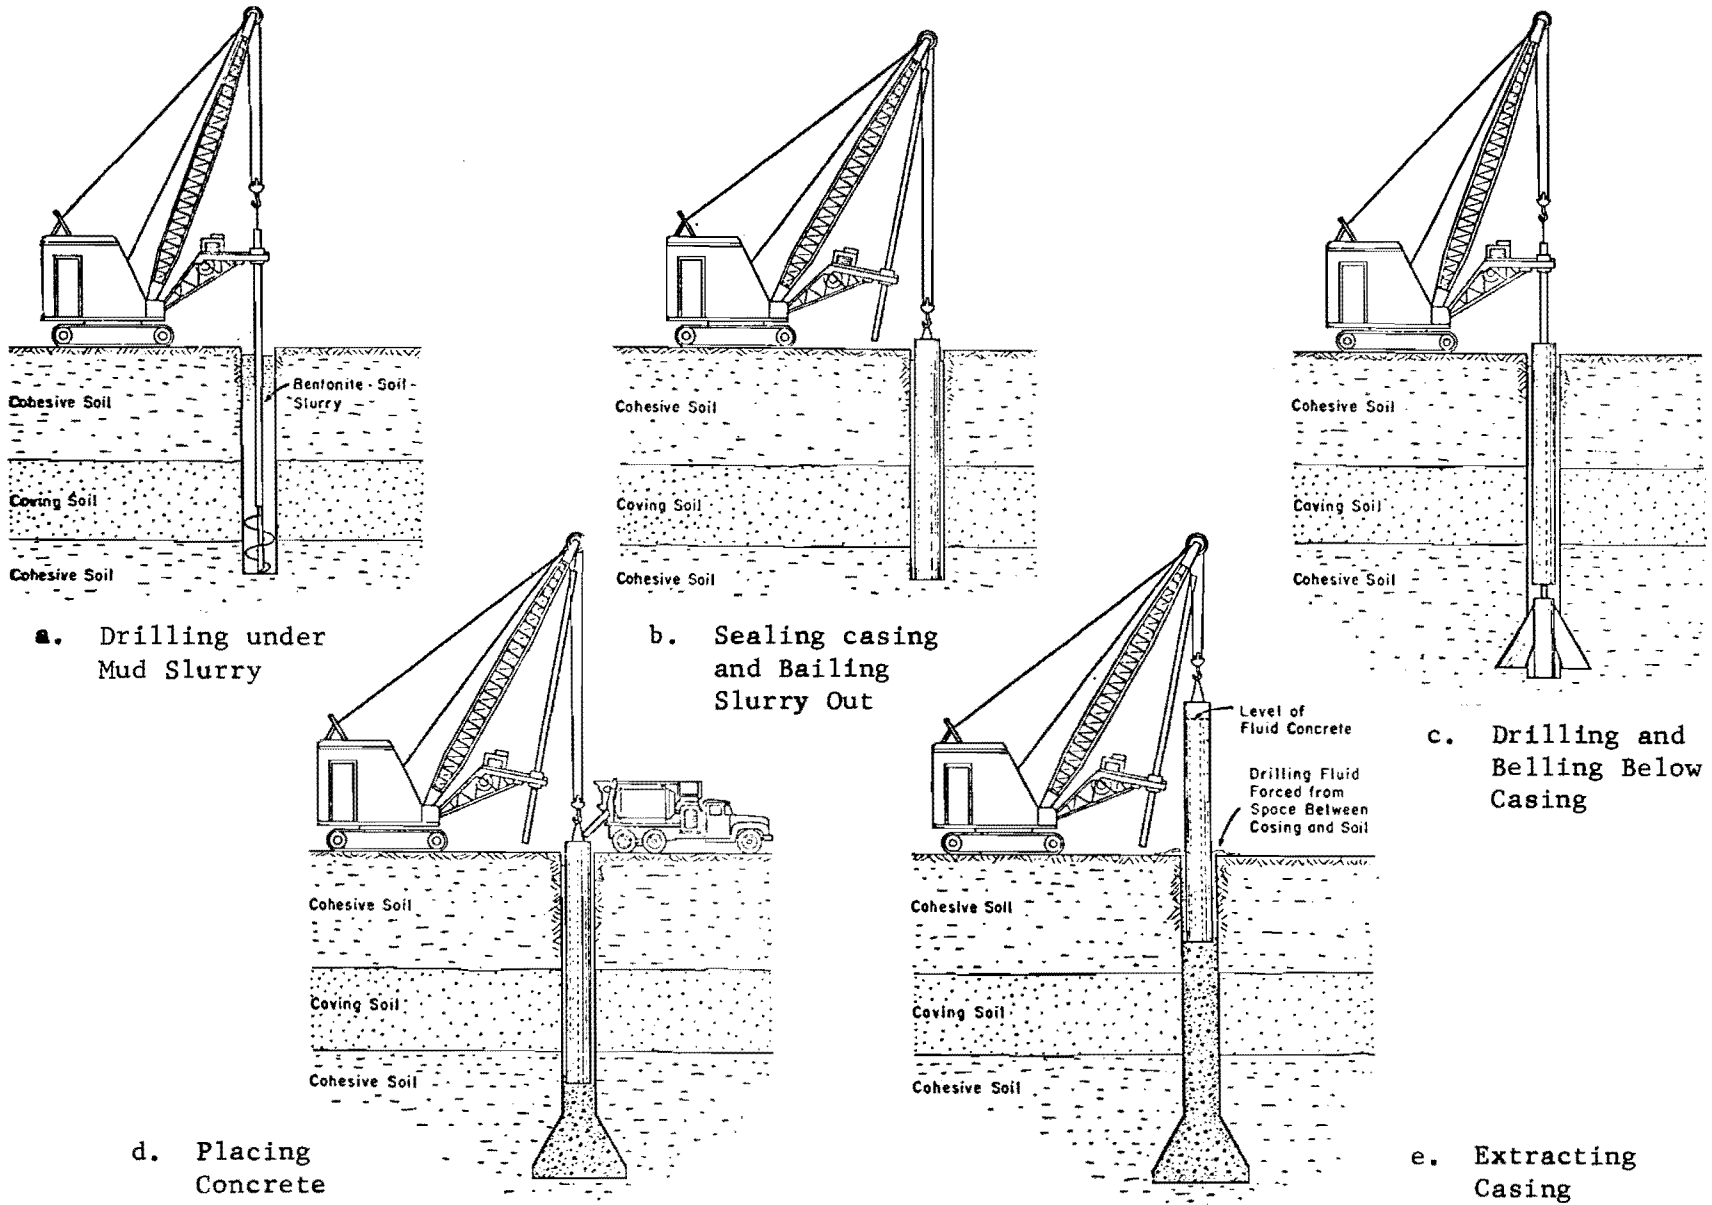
Wet Drilling and Dry Concreting, with Casing
